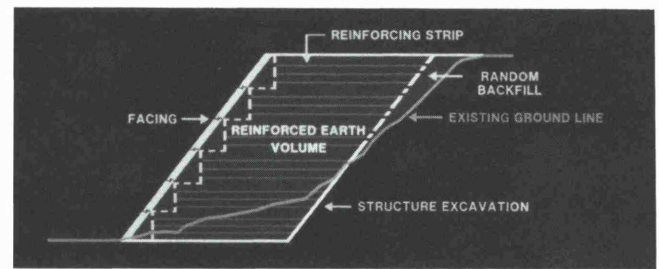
Cross-section through a sloping Reinforced Earth structure
